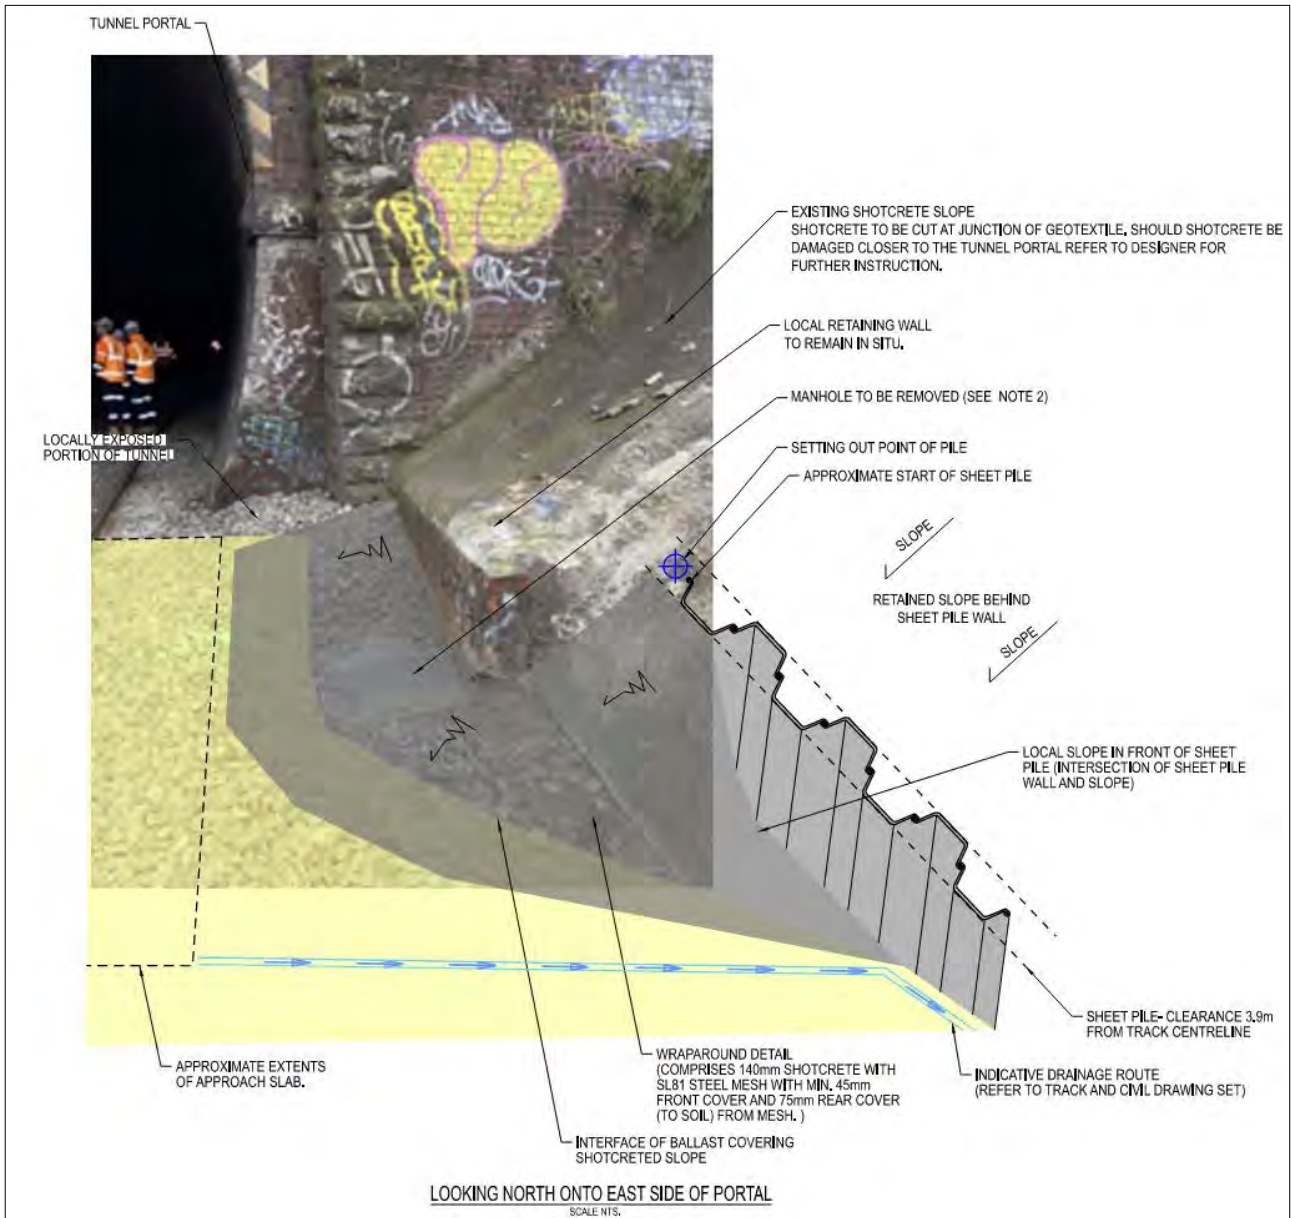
PHOTO OVERLAY SHOWING RETAINING WORKS AT TUNNEL PORTAL INTERFACE, DOWN-END PORTAL (SOURCE: AURECON/VLINE)
